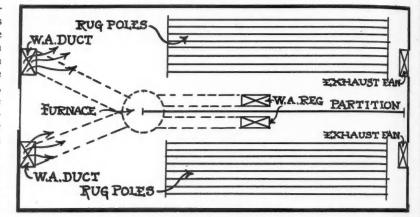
Plan of a Typical Carpet Drying Room, Moist Air Being Eliminated by a Warm Air Furnace and Exhaust Fans.
